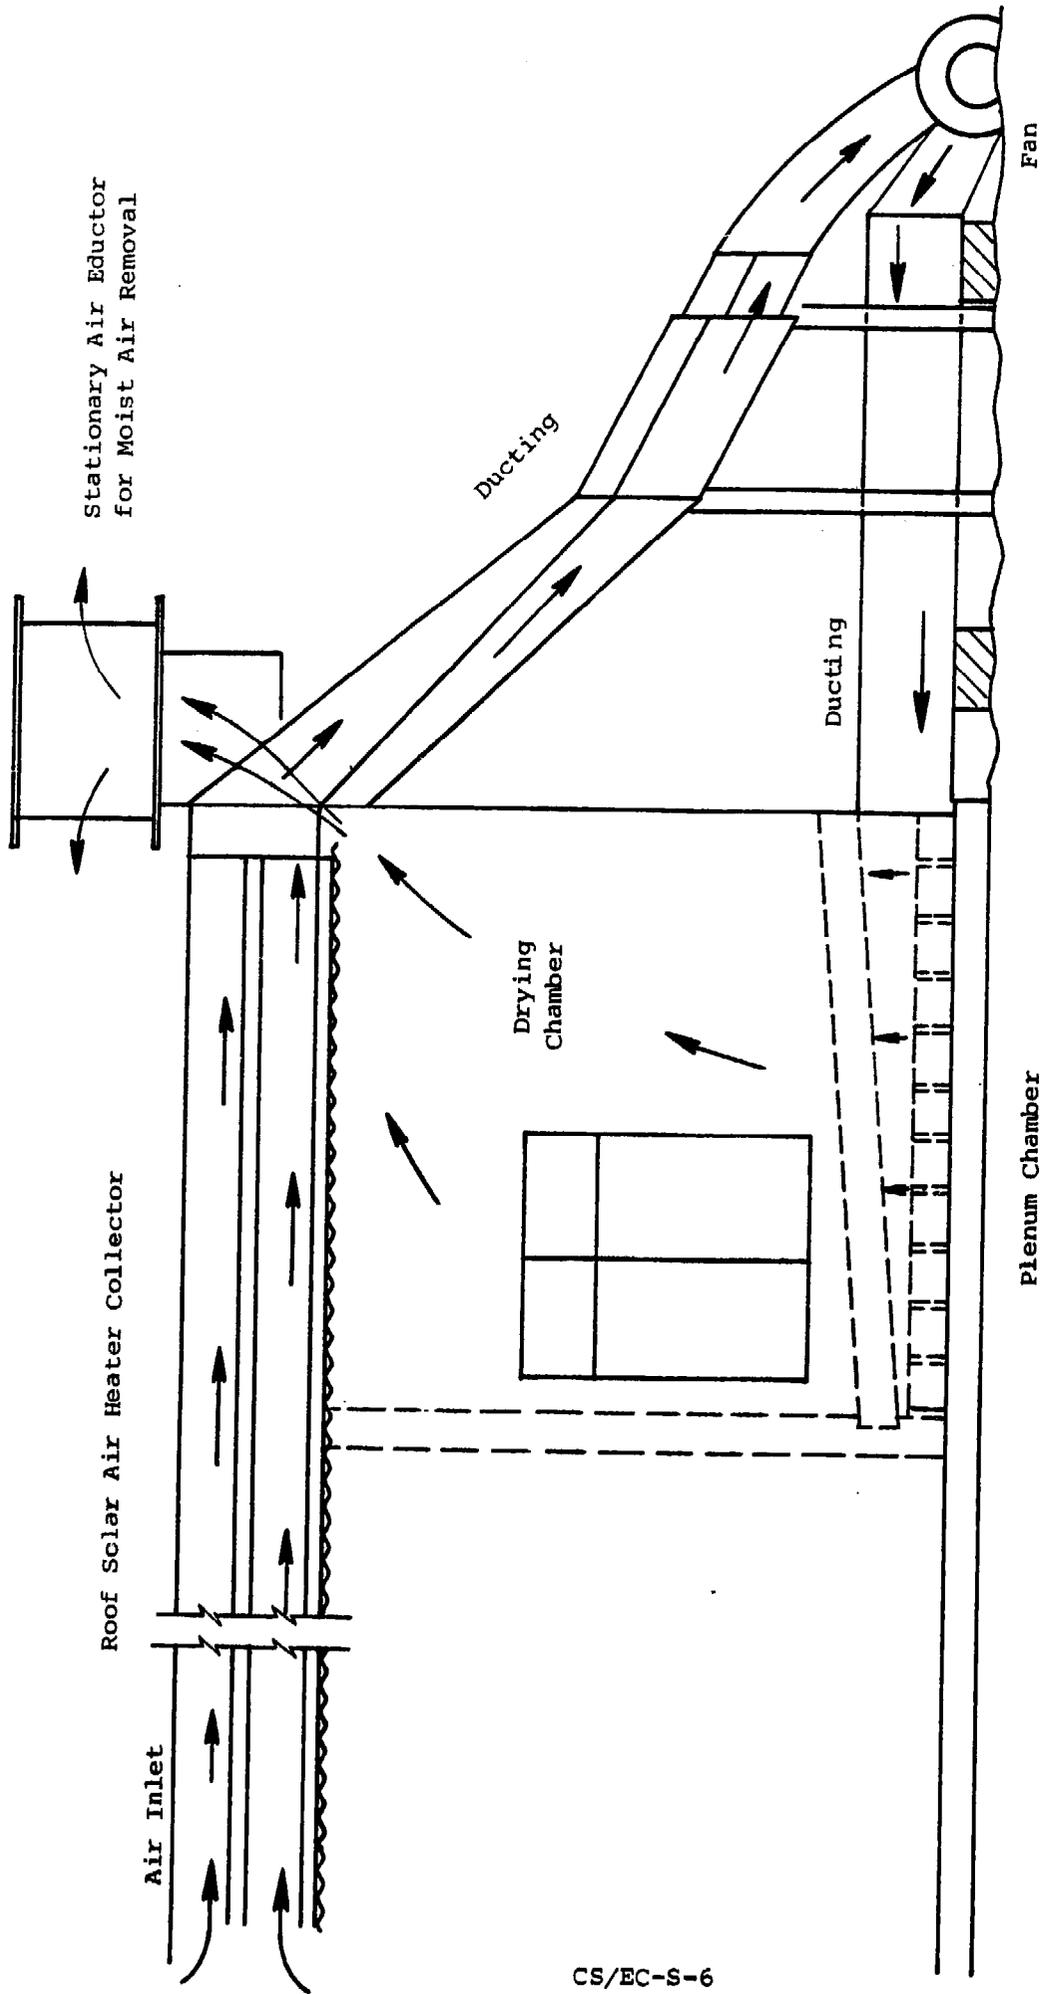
Section View of Storage Bin Dryer and Air Heater Collector
